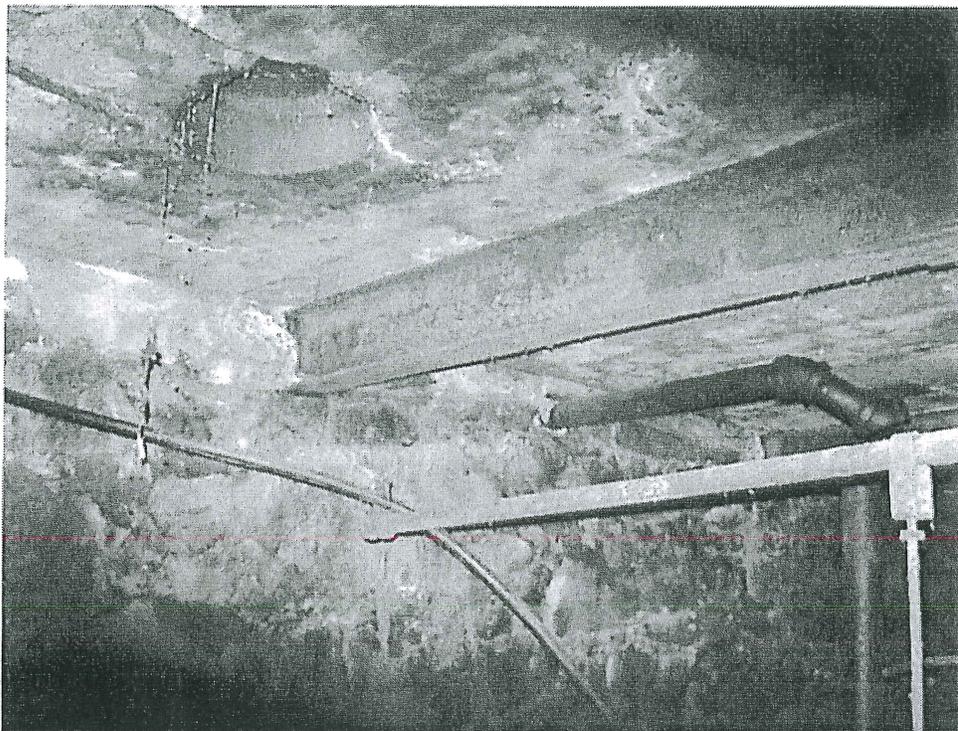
sidewalk vault framing at the Williams and Chester Bldg
